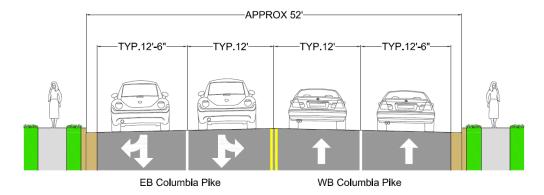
Cross Section for Intersection of Columbia Pike and John Marr Drive
